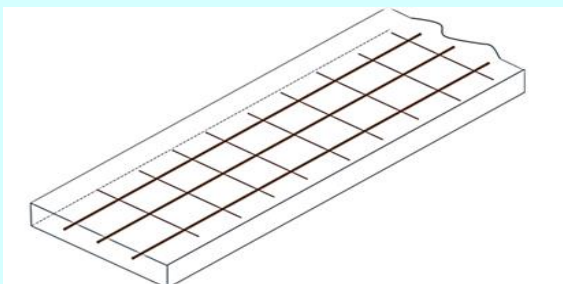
Ultrathin reinforced concrete pavement with nominal reinforcement
